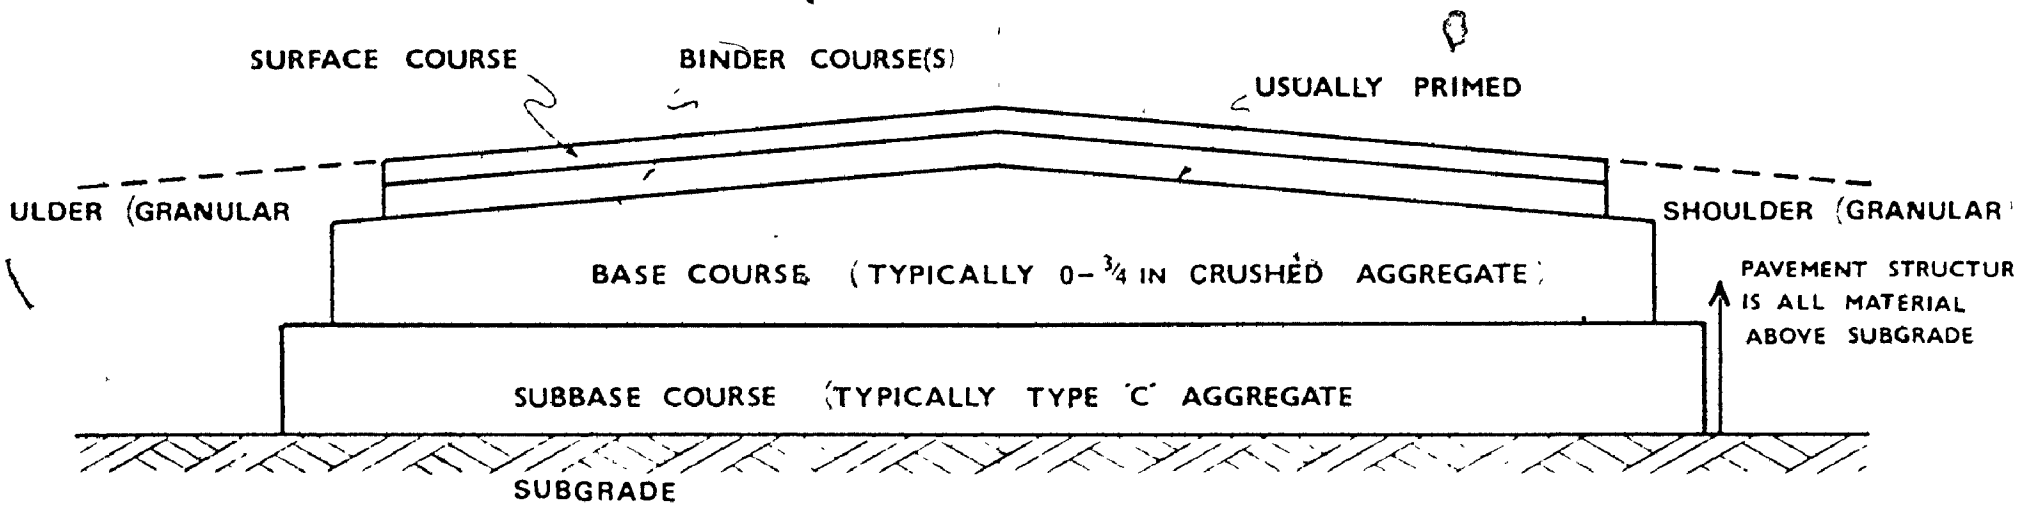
TYPICAL FLEXIBLE PAVEMENT SECTION
